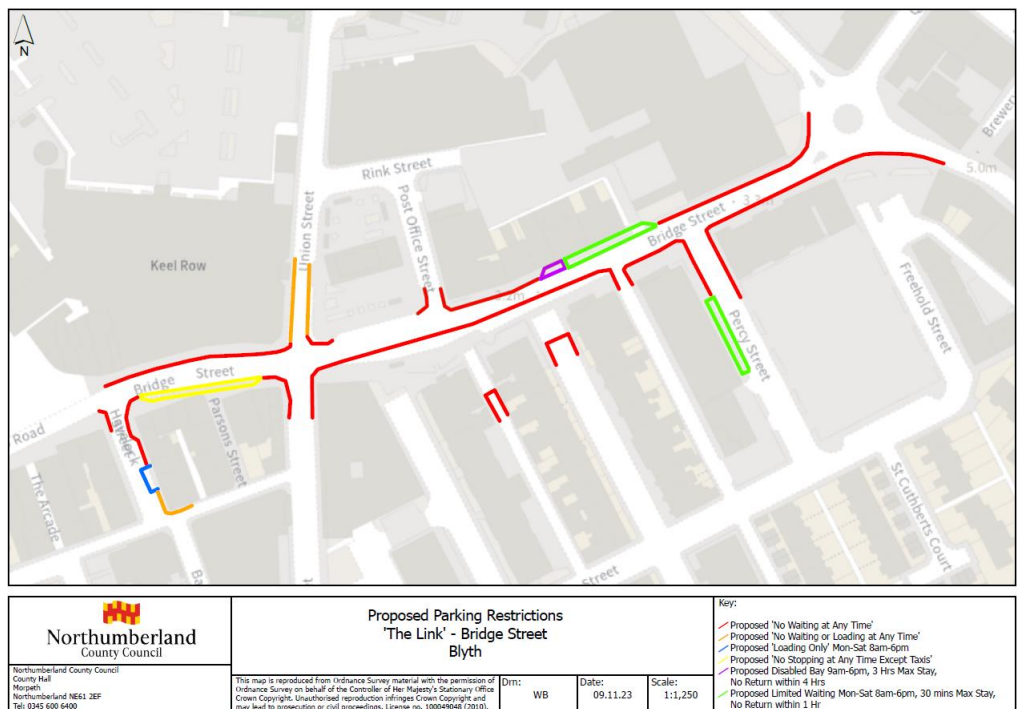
Proposed new parking restrictions at Bridge Street and its adjoining roads
